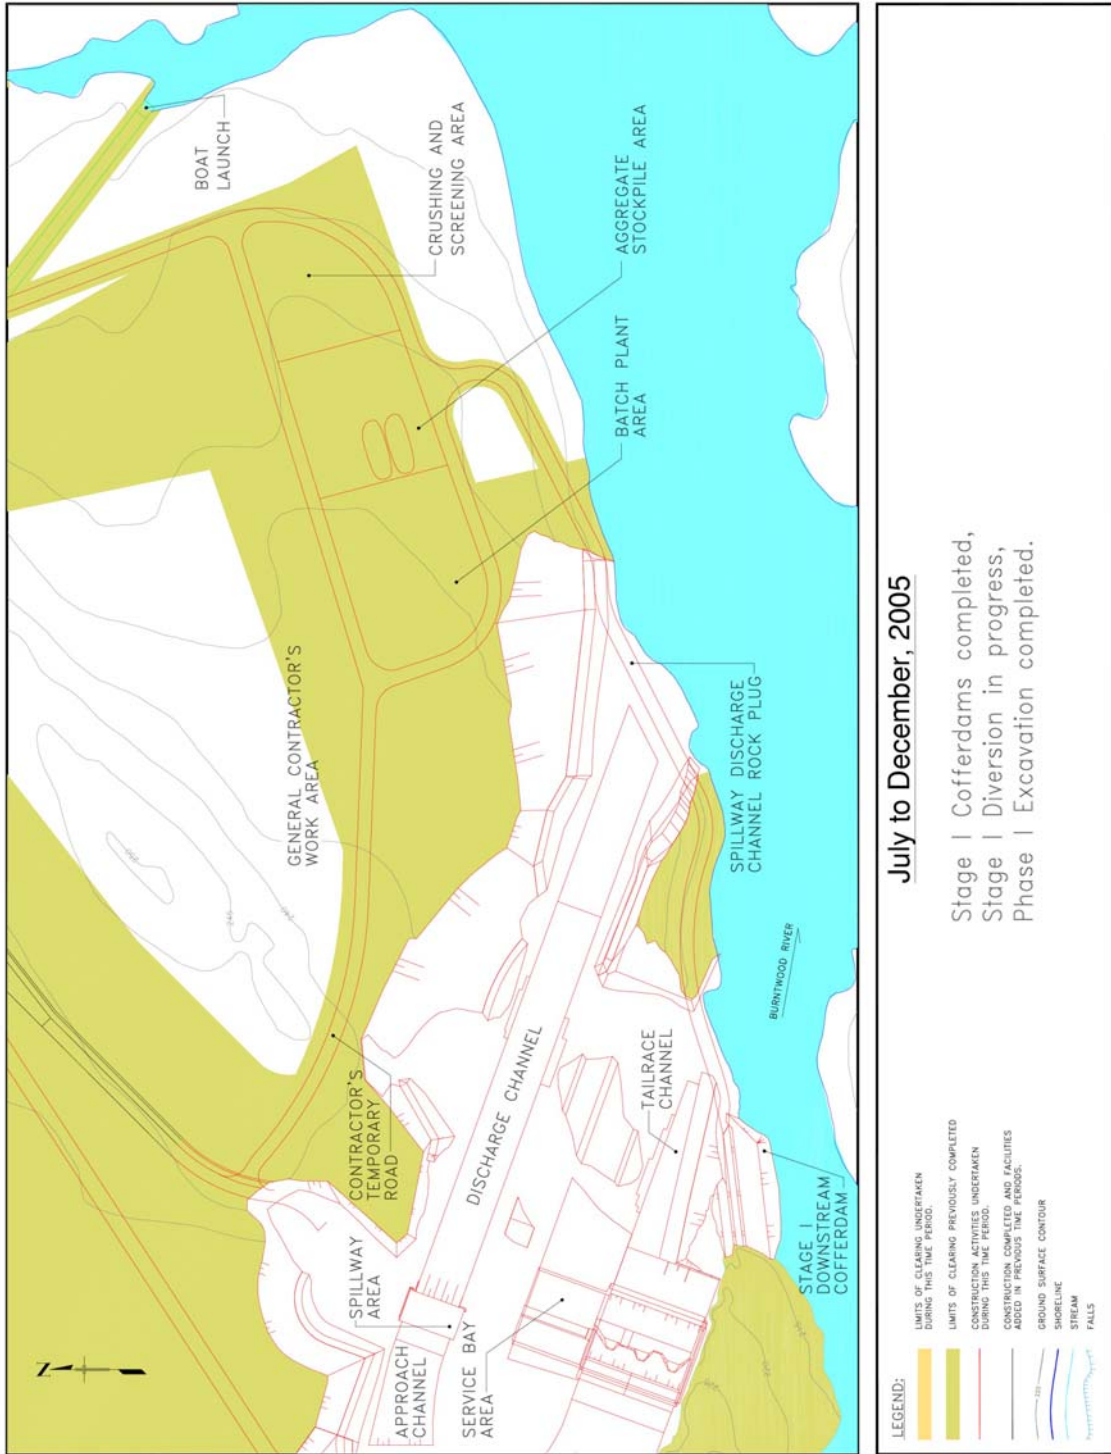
Proposed Construction Activities - July to December 2005
